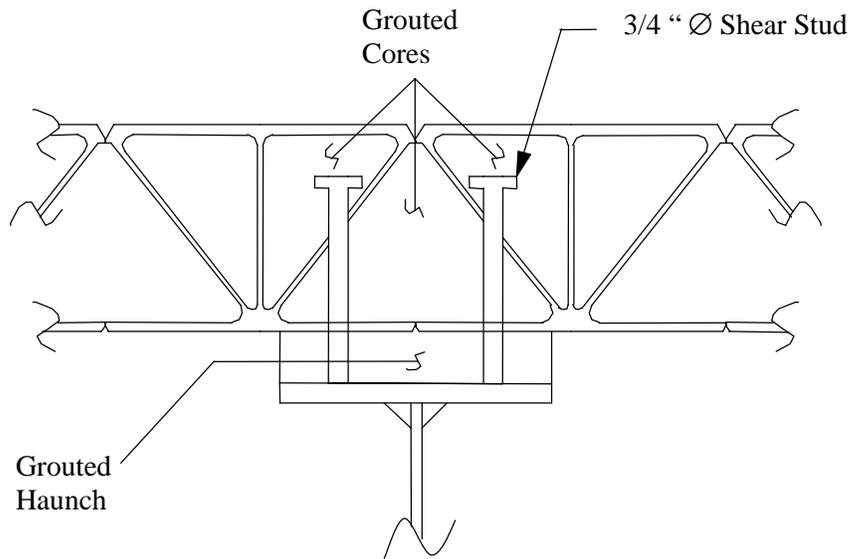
Transverse Section of the Little Buffalo Creek Bridge Superstructure (Section A-A of Figure 3.2)
